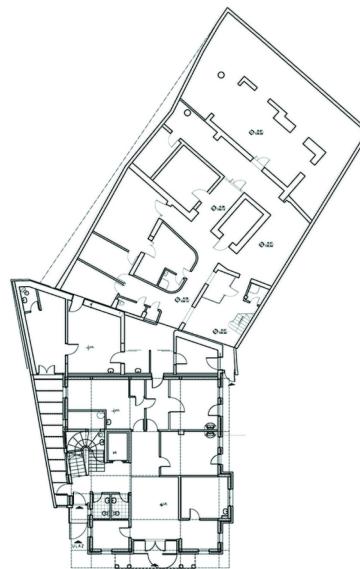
Ground floor elevation of the old building (southern part) and the new building (northern part). Source: *Technical documentation of the private health care center, 2016
